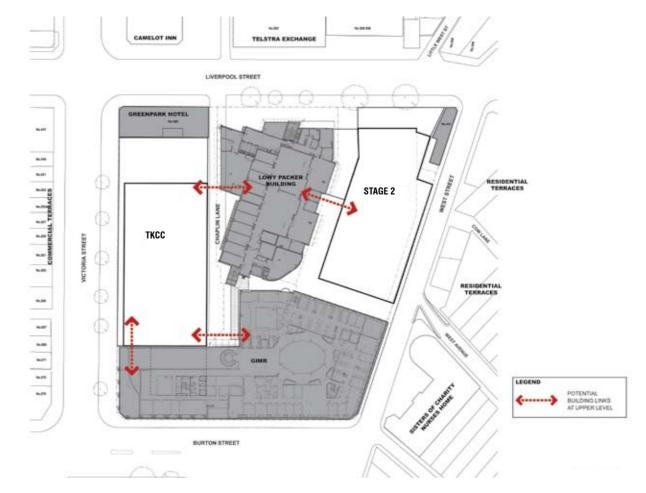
Potential Upper Level Connections (Source: Daryl Jackson Robyn Dyke Architecture)
